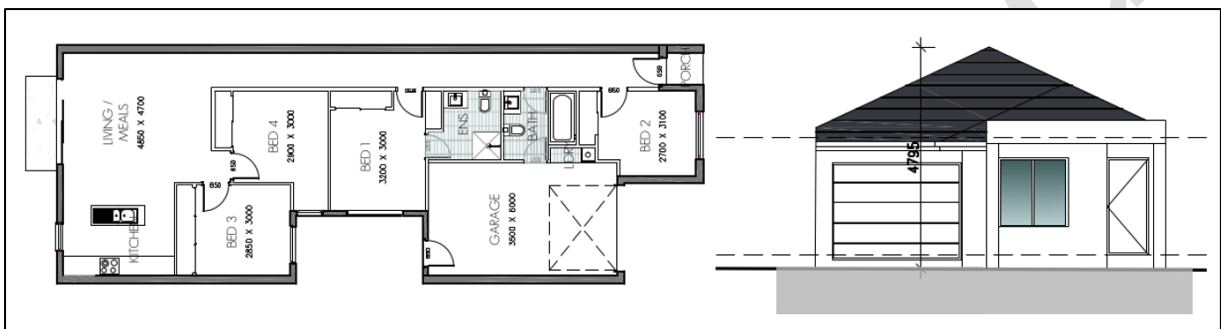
(above): Layout C Units floor plan (left) and front elevation (right). Source: Application documents.
